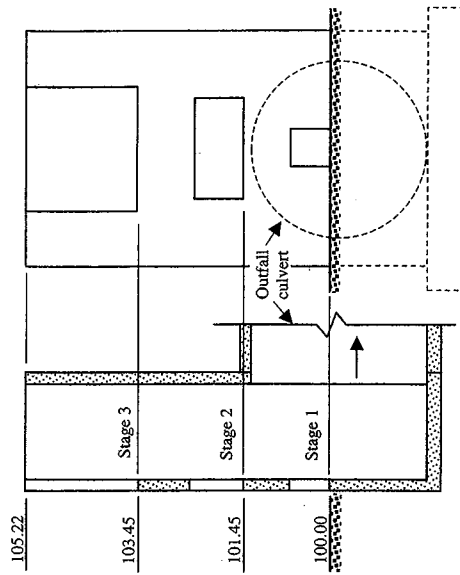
Outlet geometry for the final design of the riser box of Example 12.5
